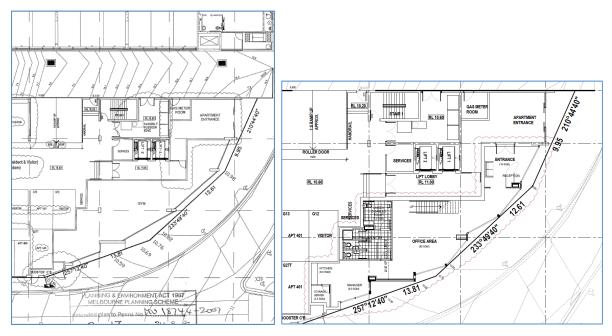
Extract of the endorsed ground floor plan (left) compared to the extract of the proposed ground floor plan (right) (Source: applicant)
